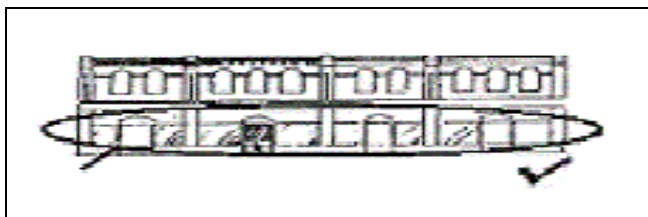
Shop front and openings are to be sympathetic with the overall proportions of the building and the division of the building into vertical bays.
